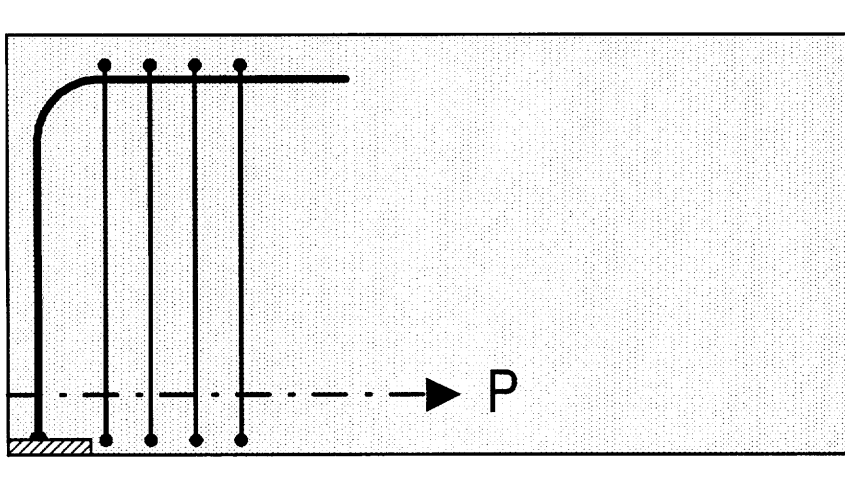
Example of spalling reinforcement. (No other reinforcement is shown.)
